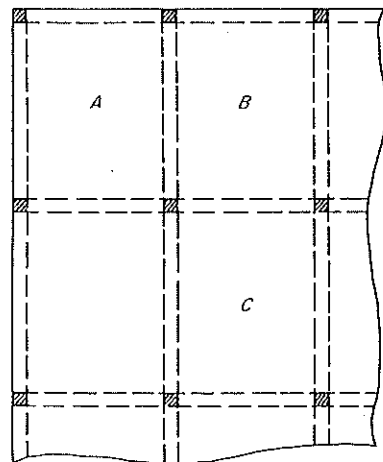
Portion of typical two-way slab floor with beams on column lines.
